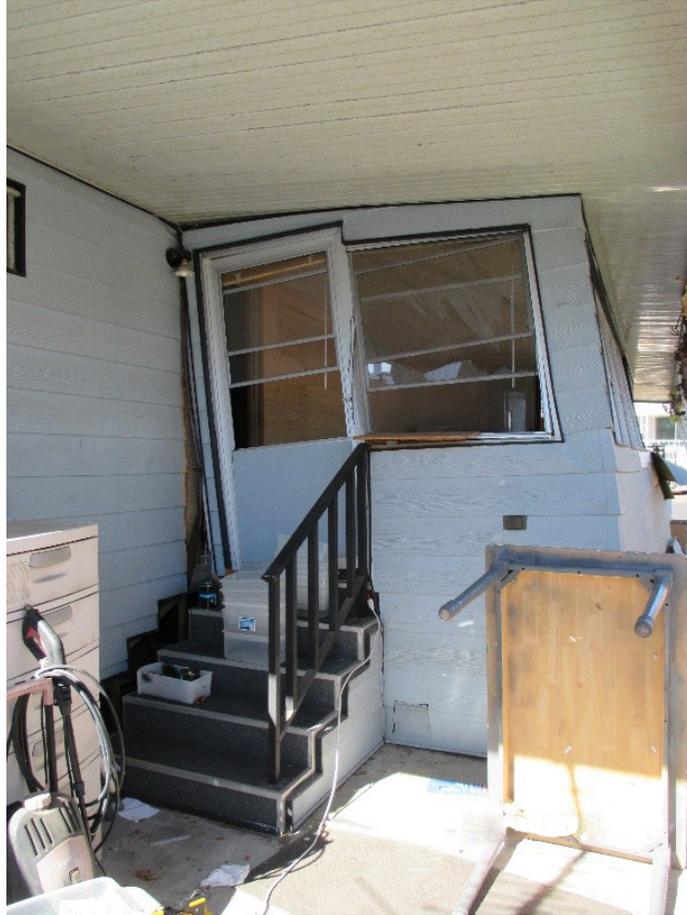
Add-on porch structure severely damaged by the earthquake.
